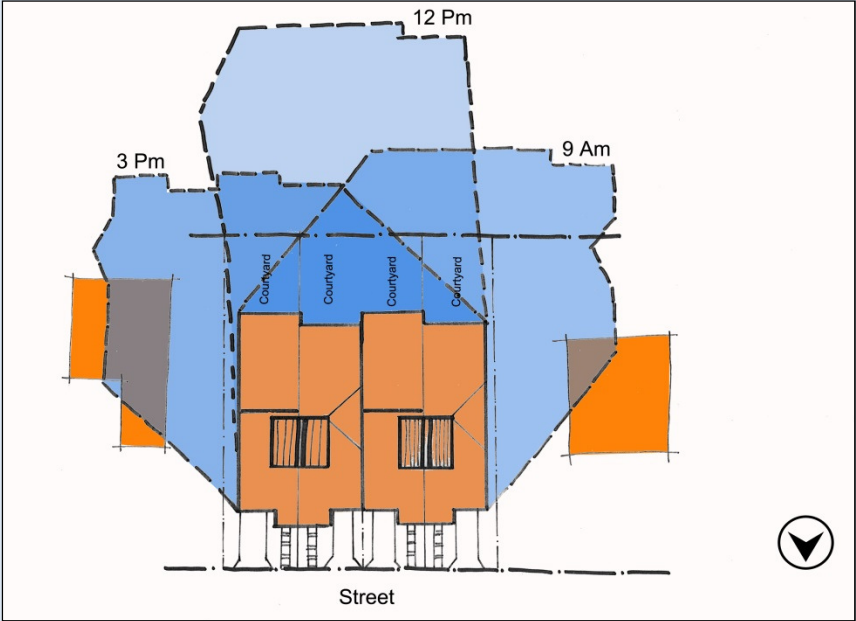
Example Solar Access to Adjoining Properties and Principal Private Open Space
